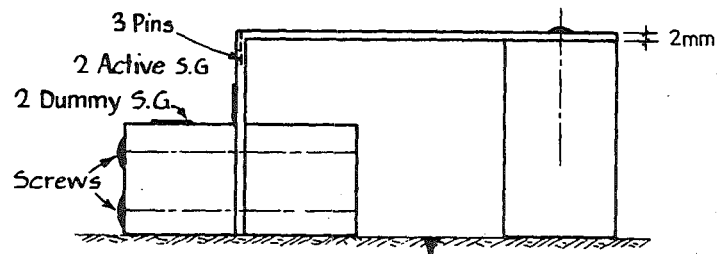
TYPICAL MODEL BEAM STRAIN GAUGE INSTRUMENTATION
